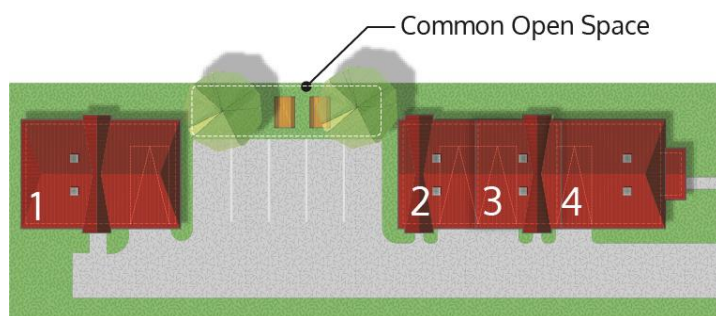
Sample townhouse site plan on a typical north downtown lot showing modestly reduced parking and driveway requirements
